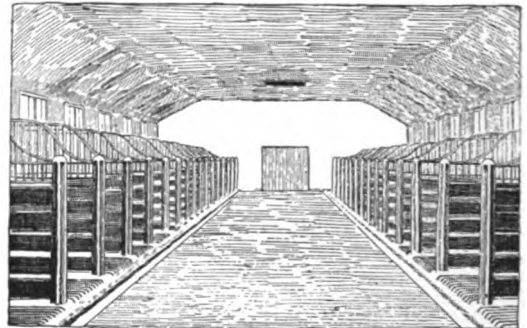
Interior of horse stable with a row of stalls on either side of a wide passageway. The planks in the partitions are placed about two inches apart, which greatly improves the ventilation of the stall.
